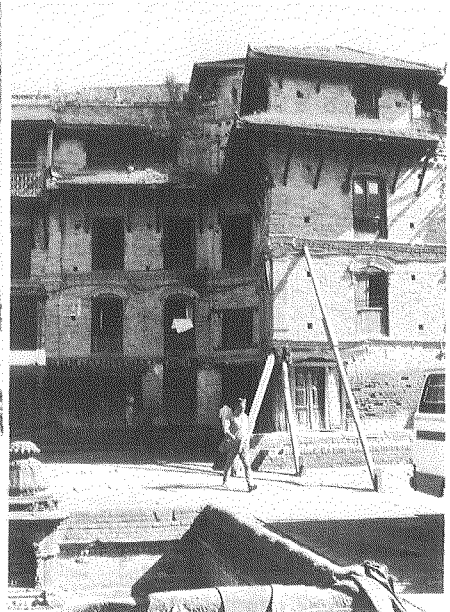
View of 4 storeyed brick houses (Bhakatpur)
